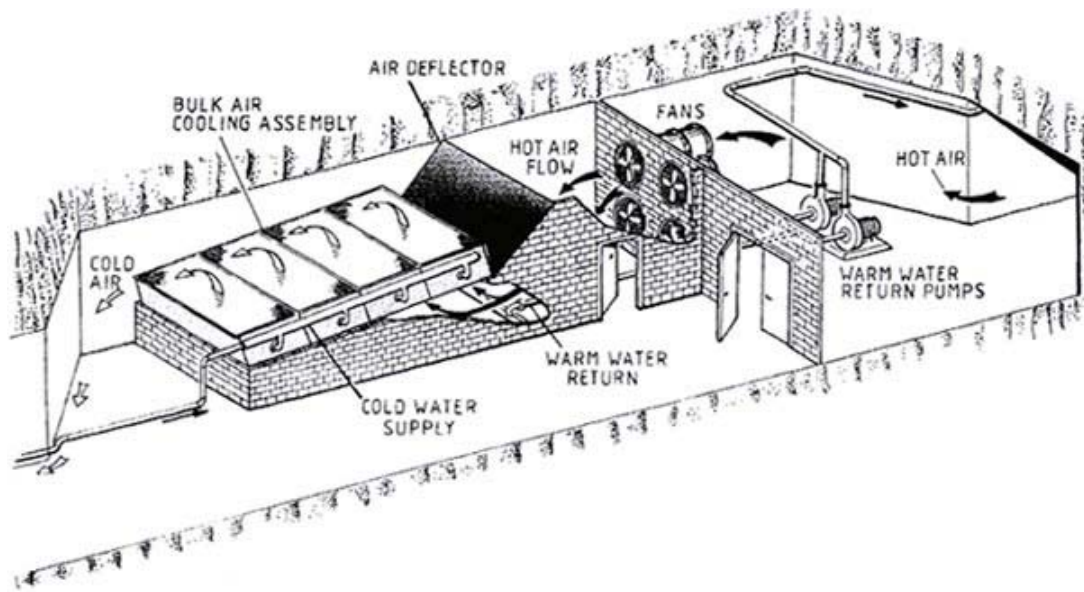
Spray chamber layout (Heat and Fluid Engineering).
